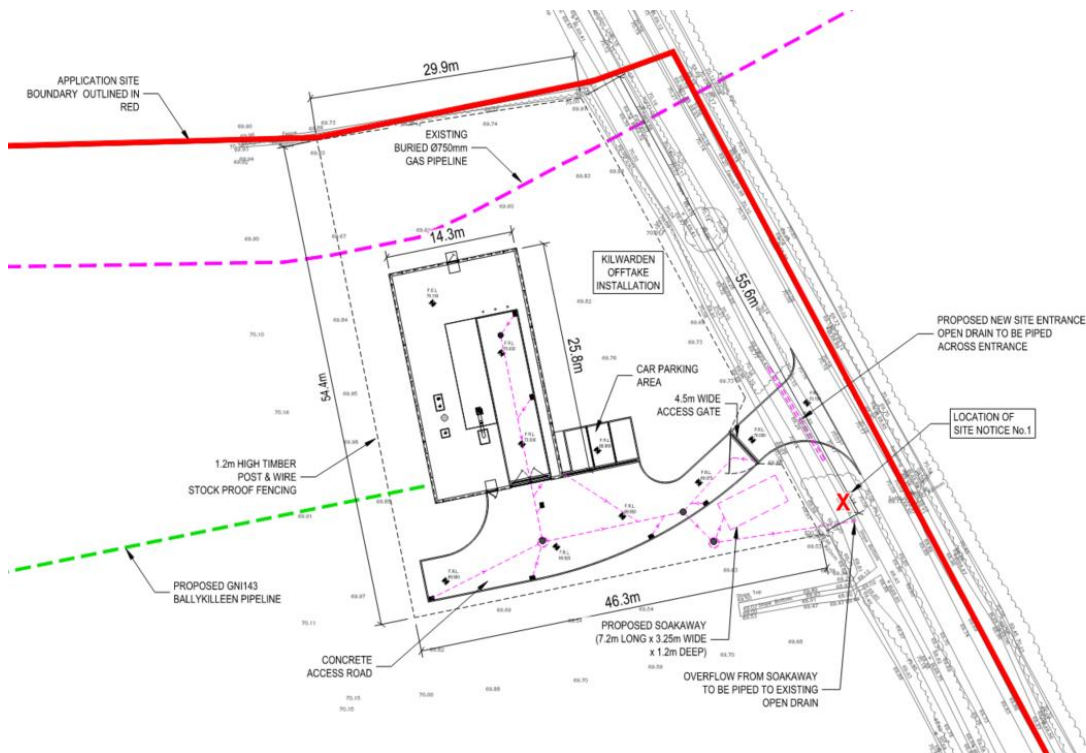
14301-GNI-01-PL-SLA-0001-01 Site Layout of the Kilwarden Offtake Installation.
